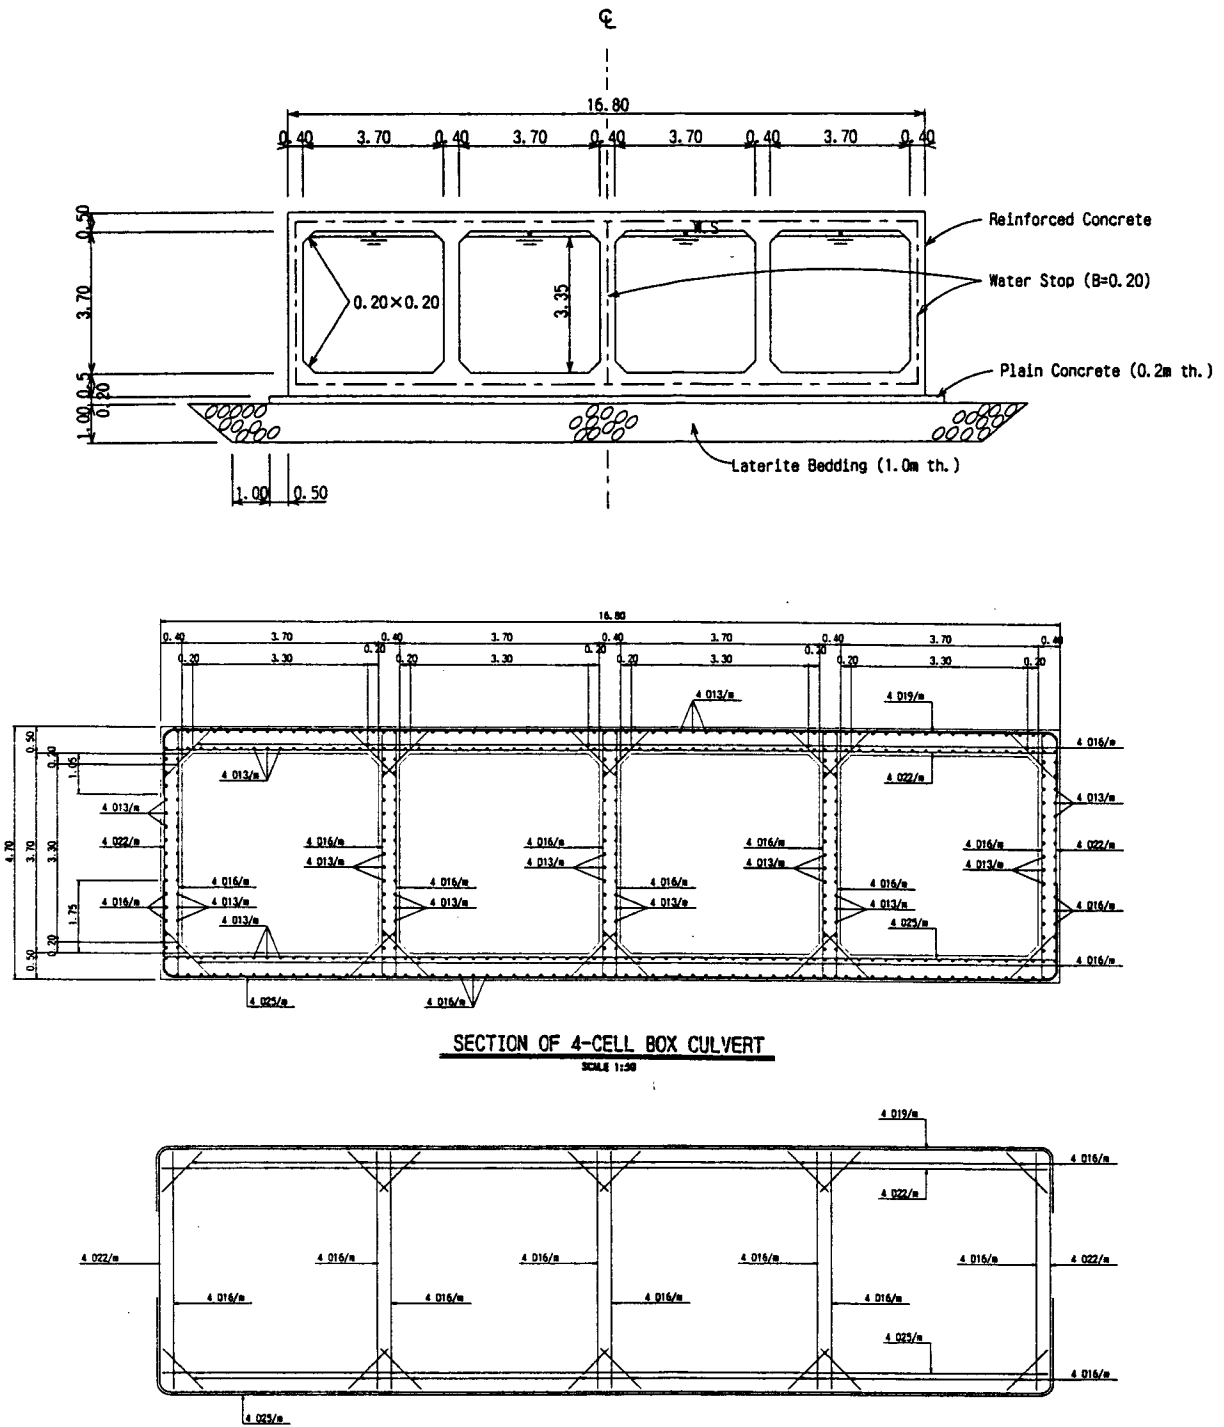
Typical Section of 4-Cell Box Culvert
